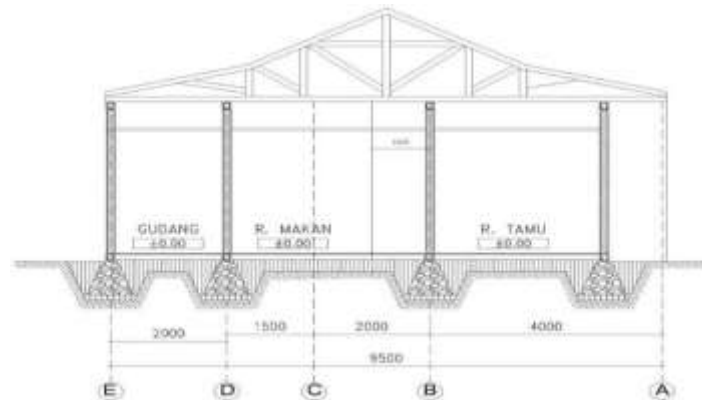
Pattern of Residential Structure of Mr. Adilin's House
